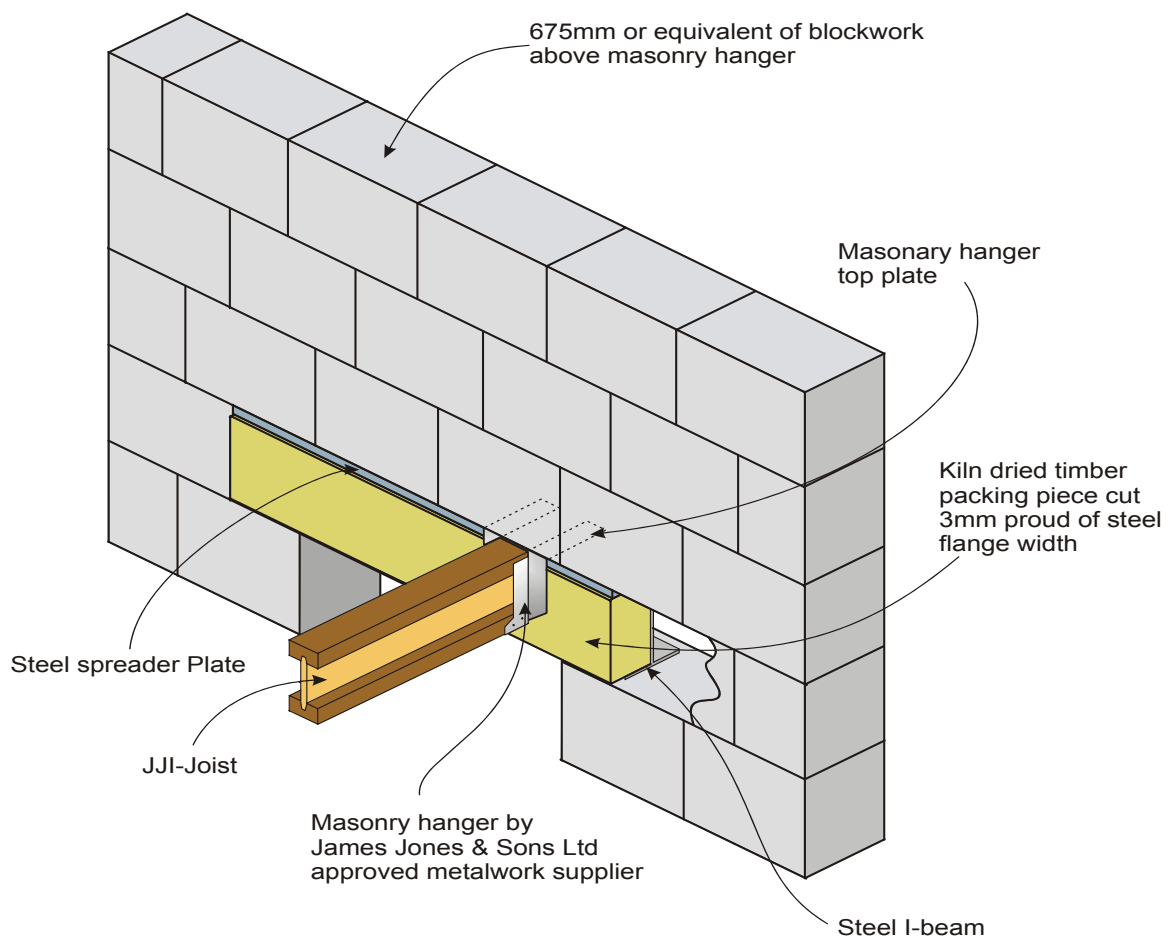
Masonry hanger to Steel Beam connection (steel beam with Spreader Plate)
